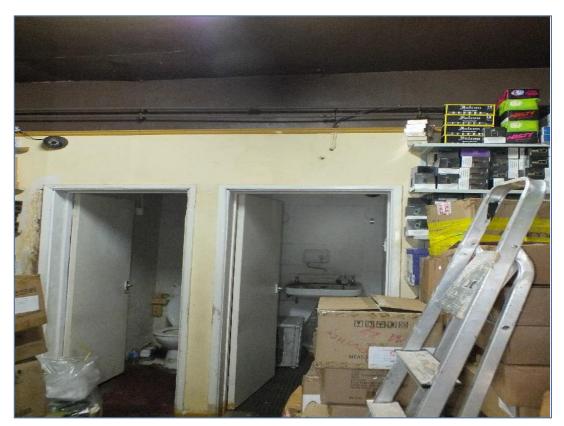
Ground floor modern toilet cubicles, No.27 Great Hampton Street
